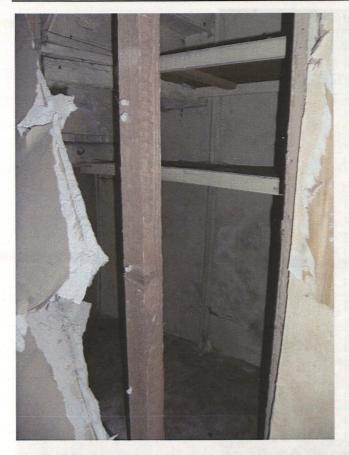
Interior of Room 1a, detail of underside of staircase and shelving in alcove behind stud partition wall, looking southeast
